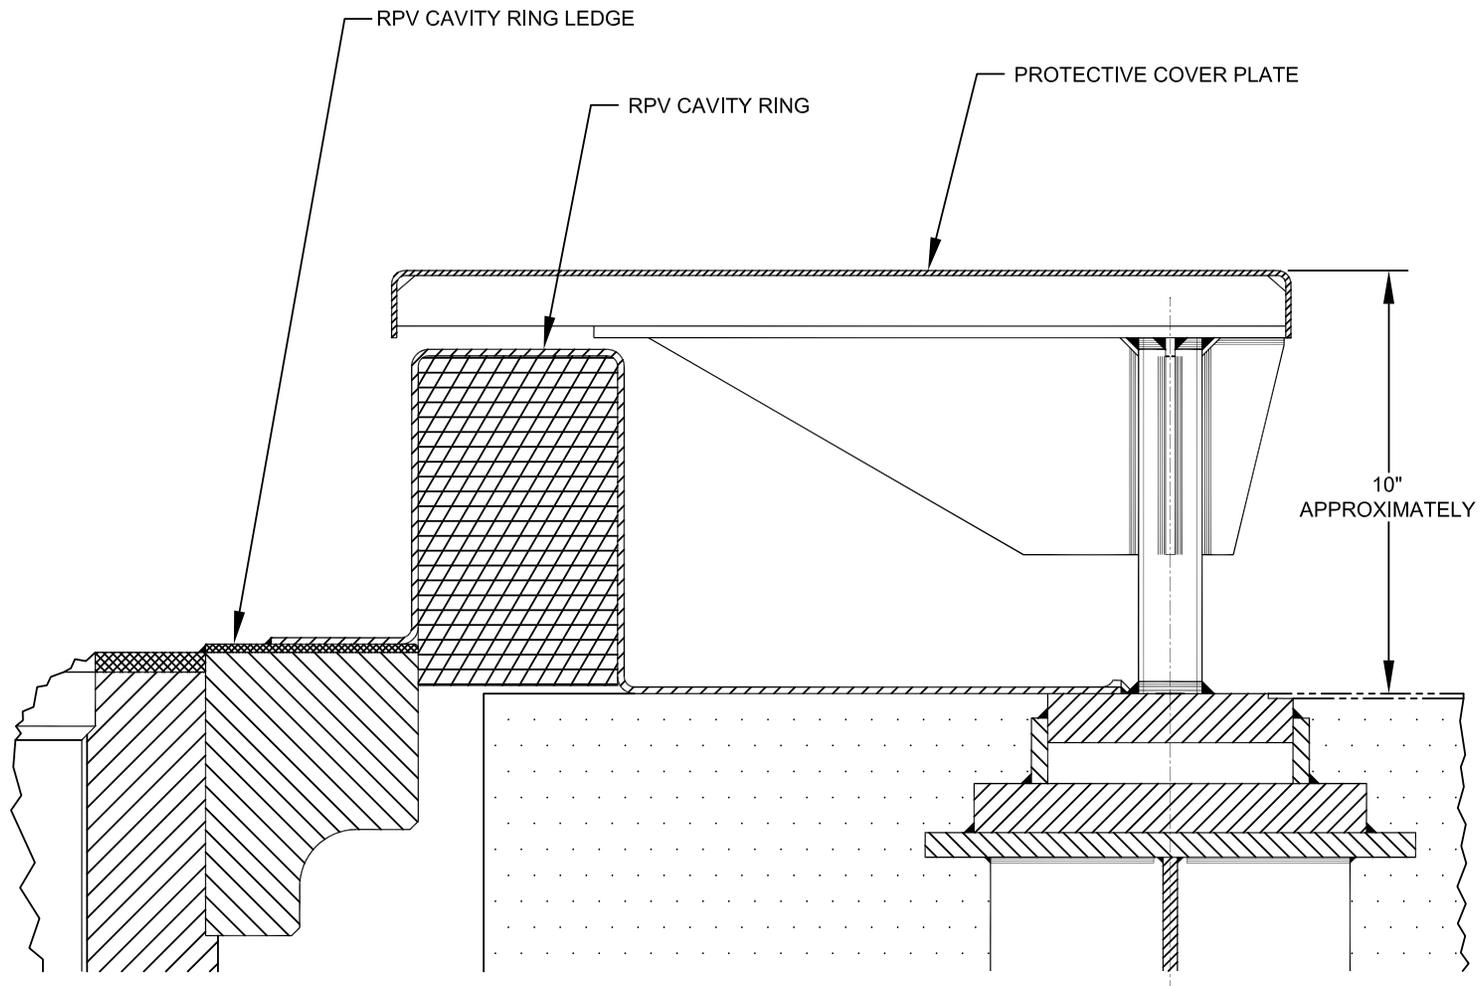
Loading Penetration Docking Mechanism
